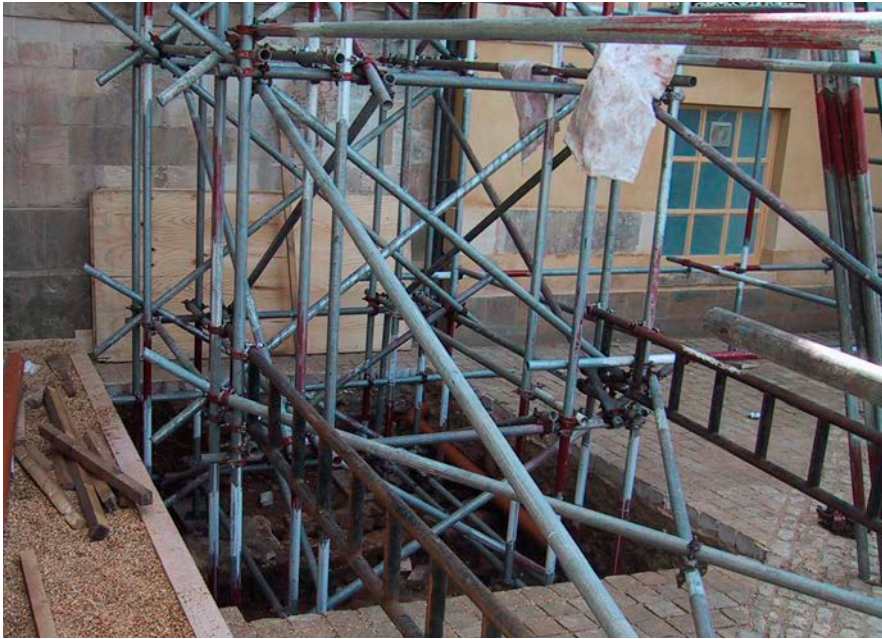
Excavation before casting a temporary insitu concrete foundation to resist lateral wind load and uplift.
